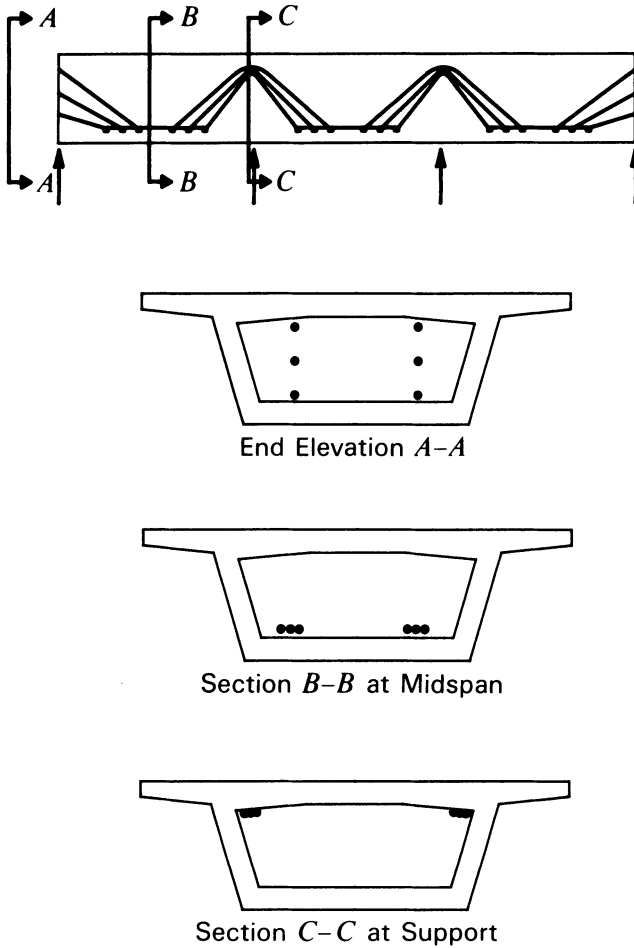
Elevation of a three-span continuous beam illustrating the paths commonly used with external tendons.
